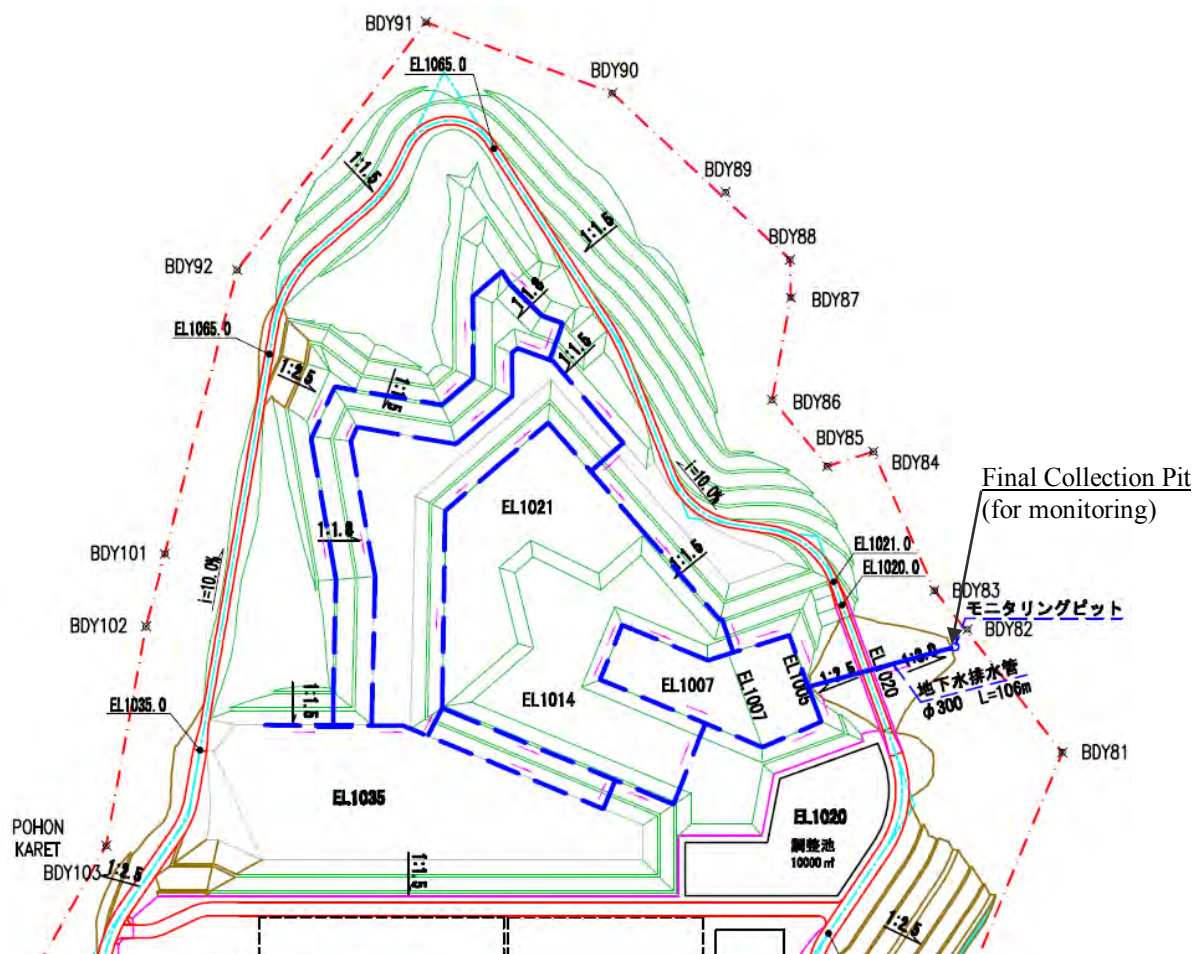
Plan of Underground Water Collection and Removal Facility
